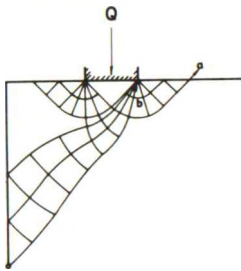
E: Strip Foundation Behind a Retaining Wall.
